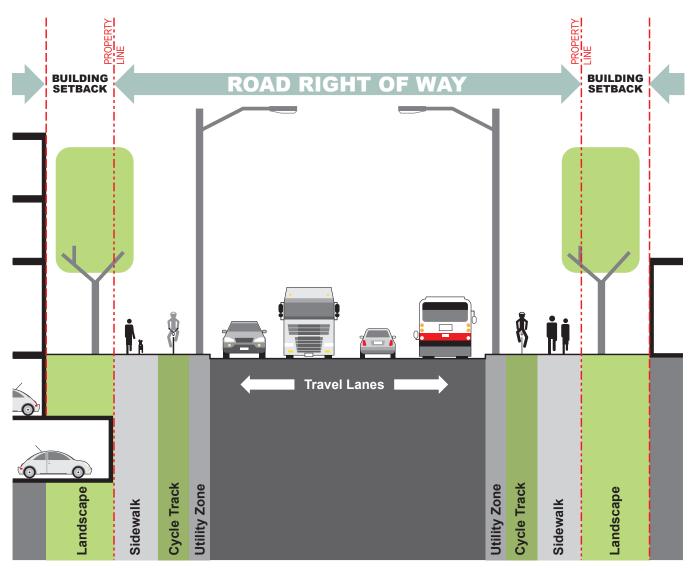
Conceptual road right-of-way layout of boulevard elements with setback of building and first level of below-grade parking indicated
